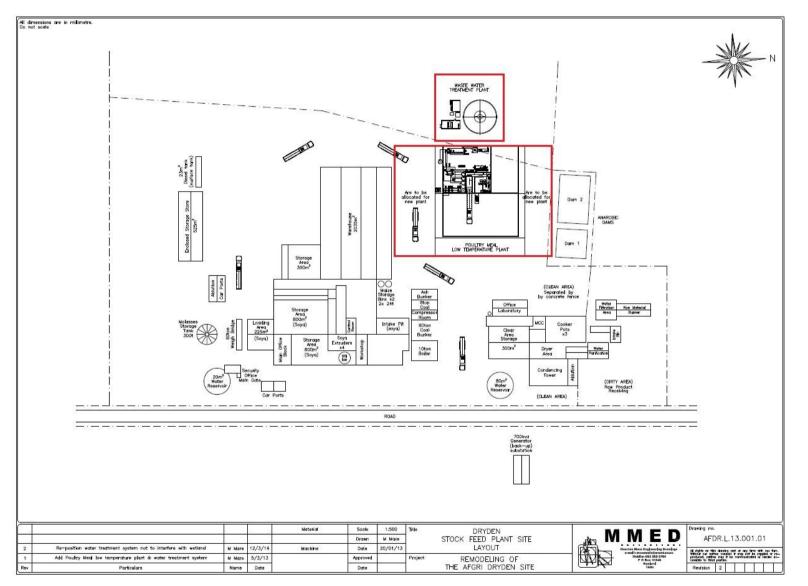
Site layout plan for the rendering facility with proposed expansions shown in red
